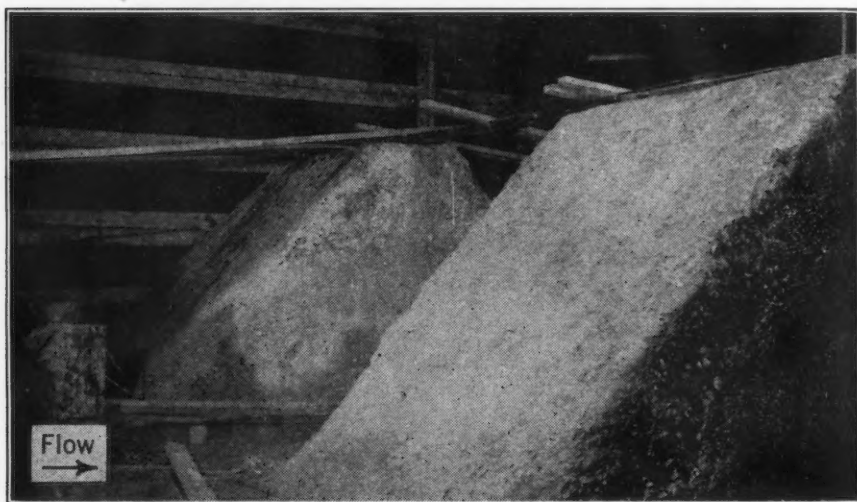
VIEW SHOWING PITTING AND EROSION OF BAFFLE PIERS ON THE SPILLWAY APRON OF BONNEVILLE DAM
